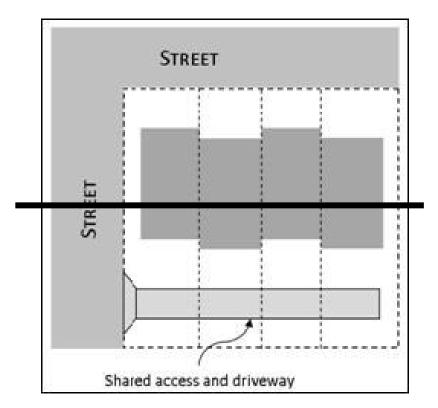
A.1 Townhouses with Parking in the Front Yard
